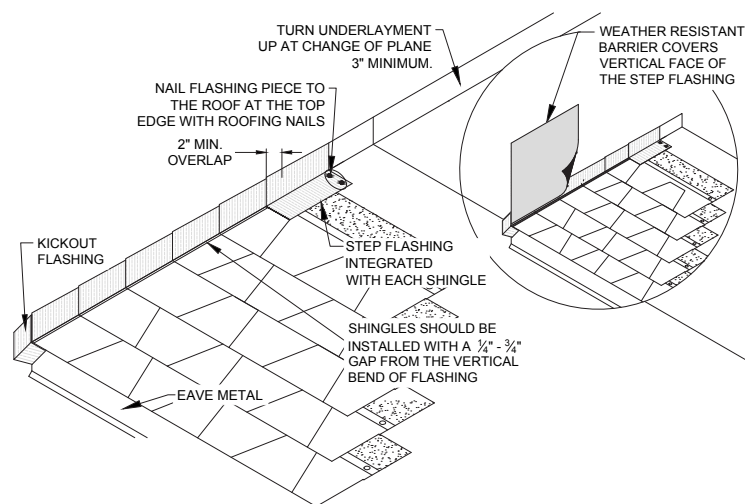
Step Flashing Application at Roof-to-Sidewall Transitions
